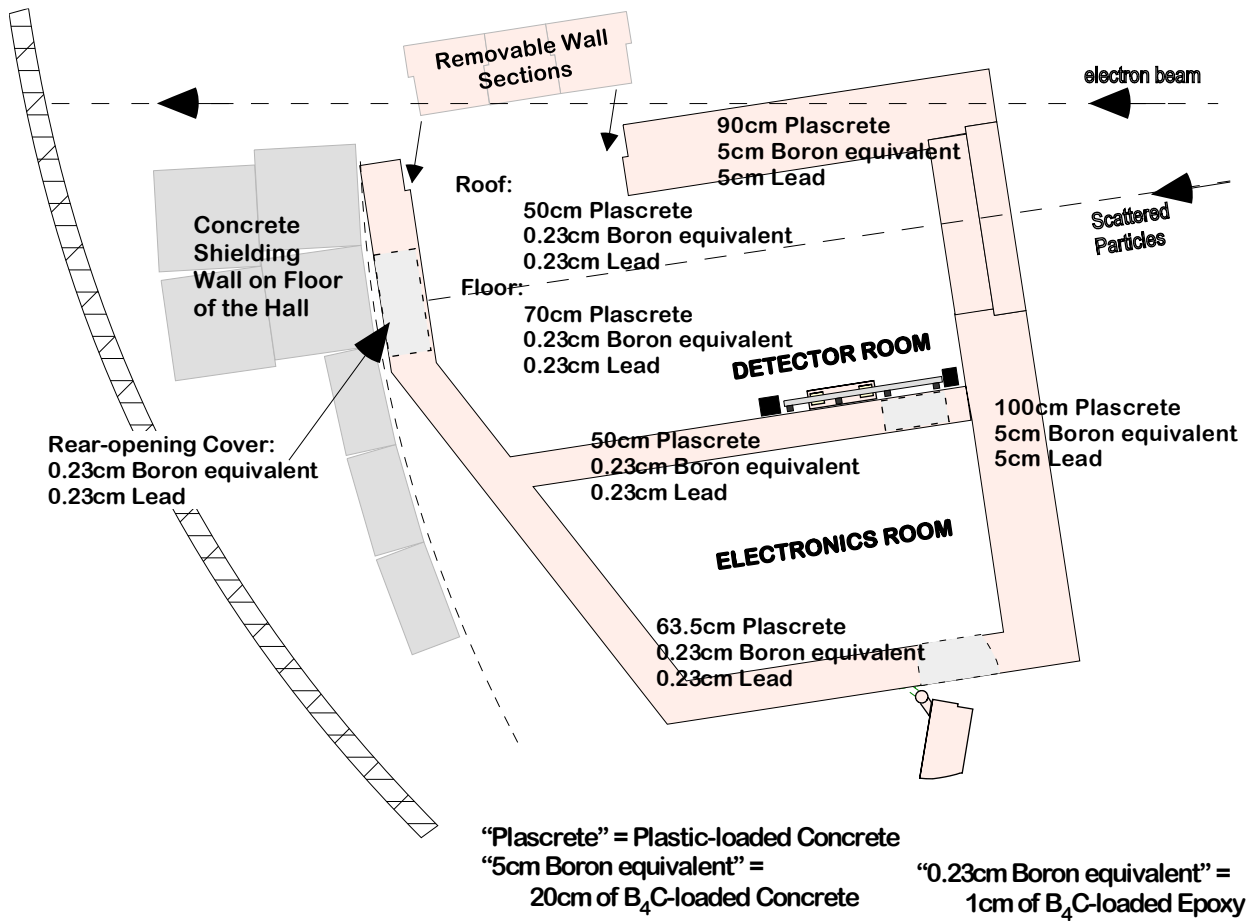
Plan View of the SHMS Shield House showing the layout, thickness, and composition of the walls.
